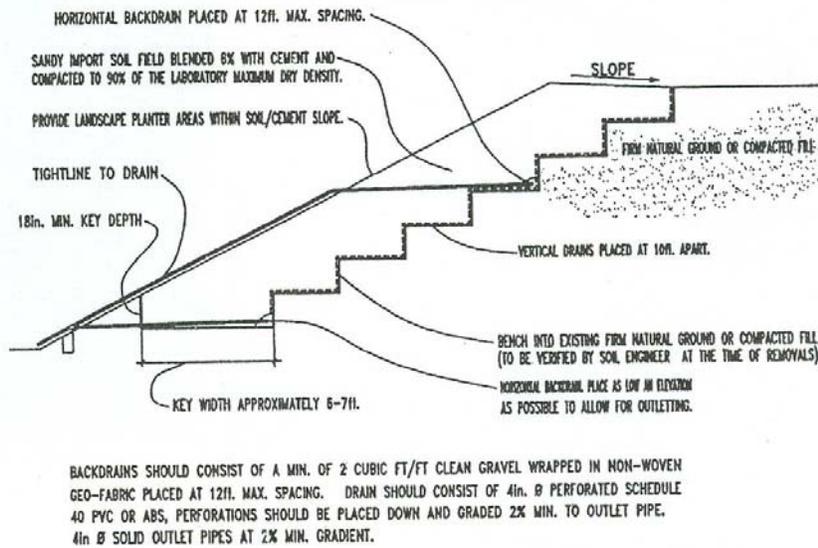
Soil cement repair of shallow slope failures (Day, 1997).
